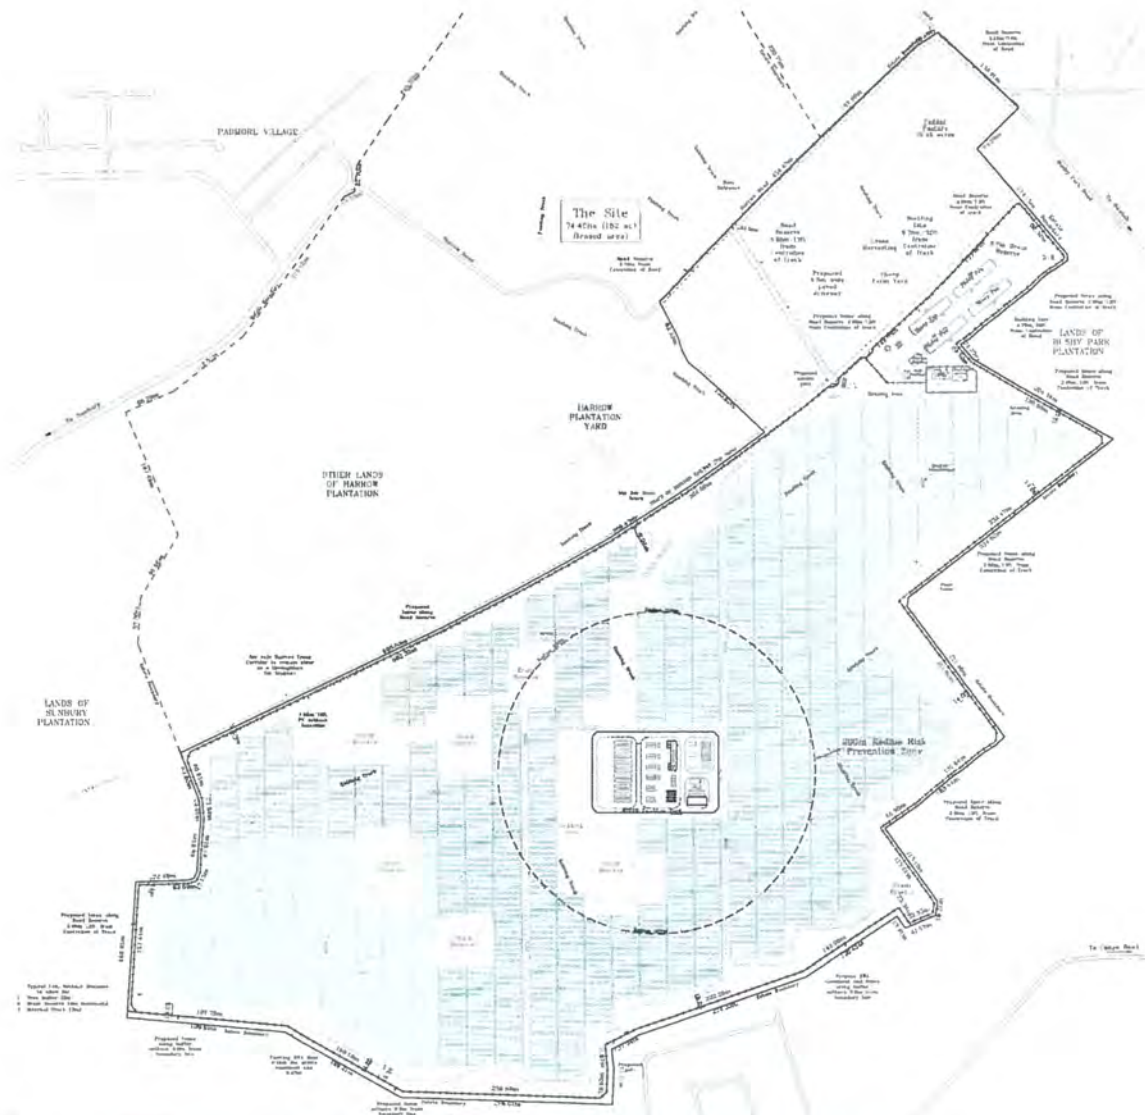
Power Plant layout at Harrow (see Planning Documents)
